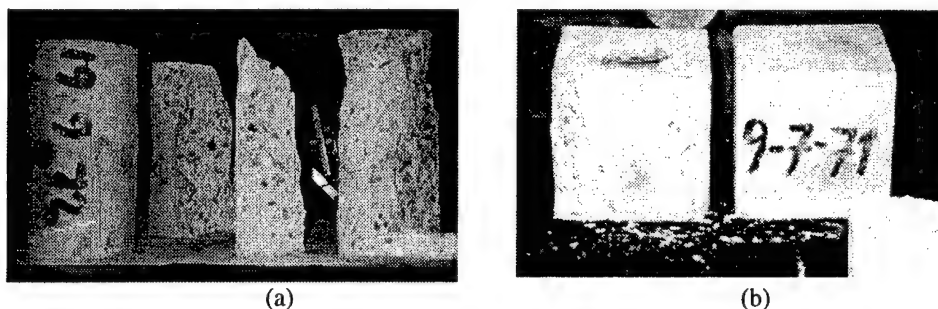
Typical photographs of fracture of concrete cylindrical (a) and cubic (b) concrete specimens from compressive loading
